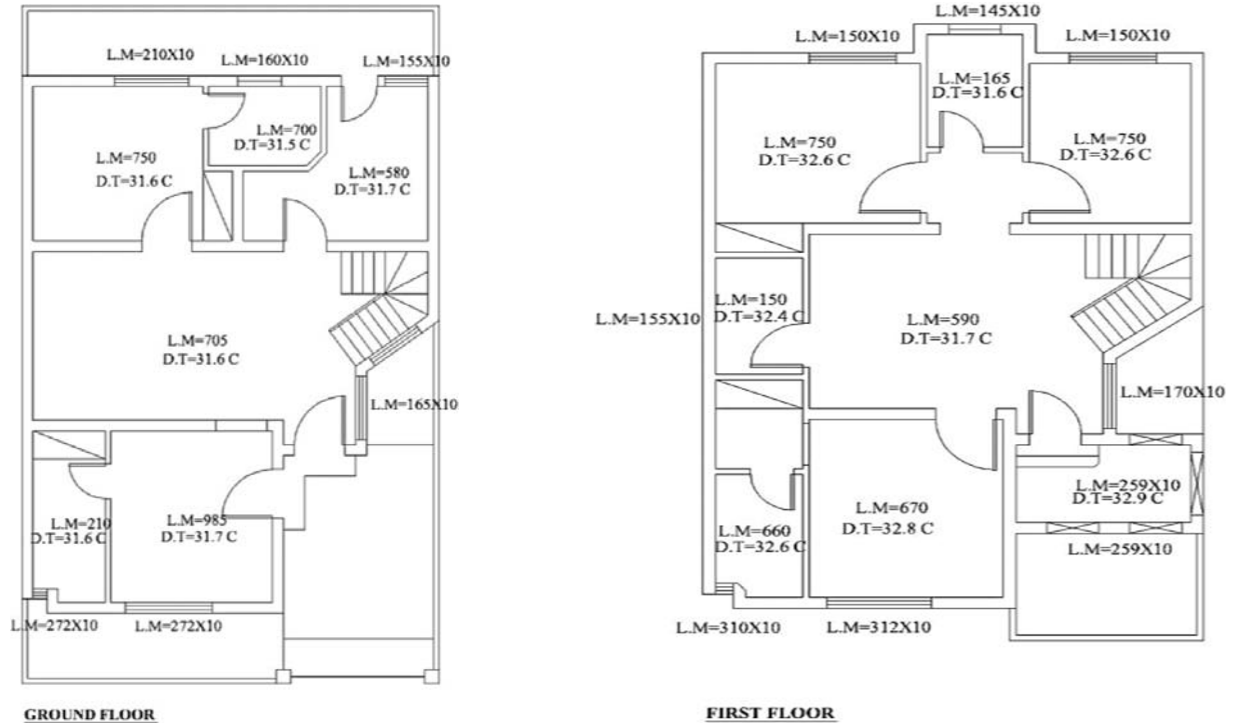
DETAILED ARCHITECTURAL PLANS OF 5 MARLA HOUSE
